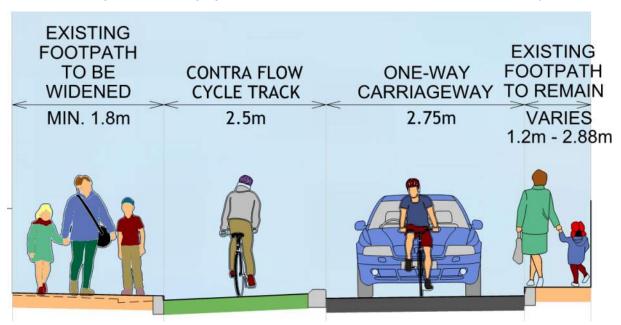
Typical Section 2 Option C Cross Section South Circular Rd - Contra Flow (at pinch point)
